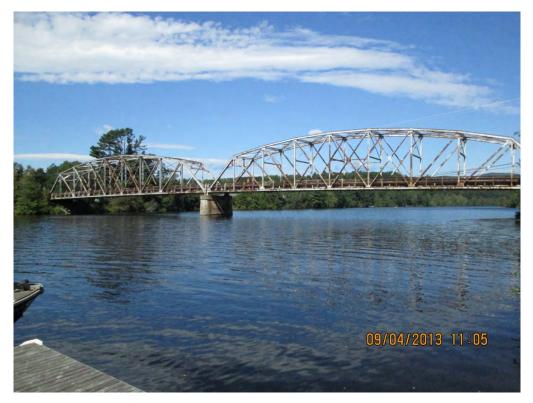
View from NH shoreline downstream of bridge looking northwesterly and upstream at areas of proposed temporary trestles during reconstruction.
